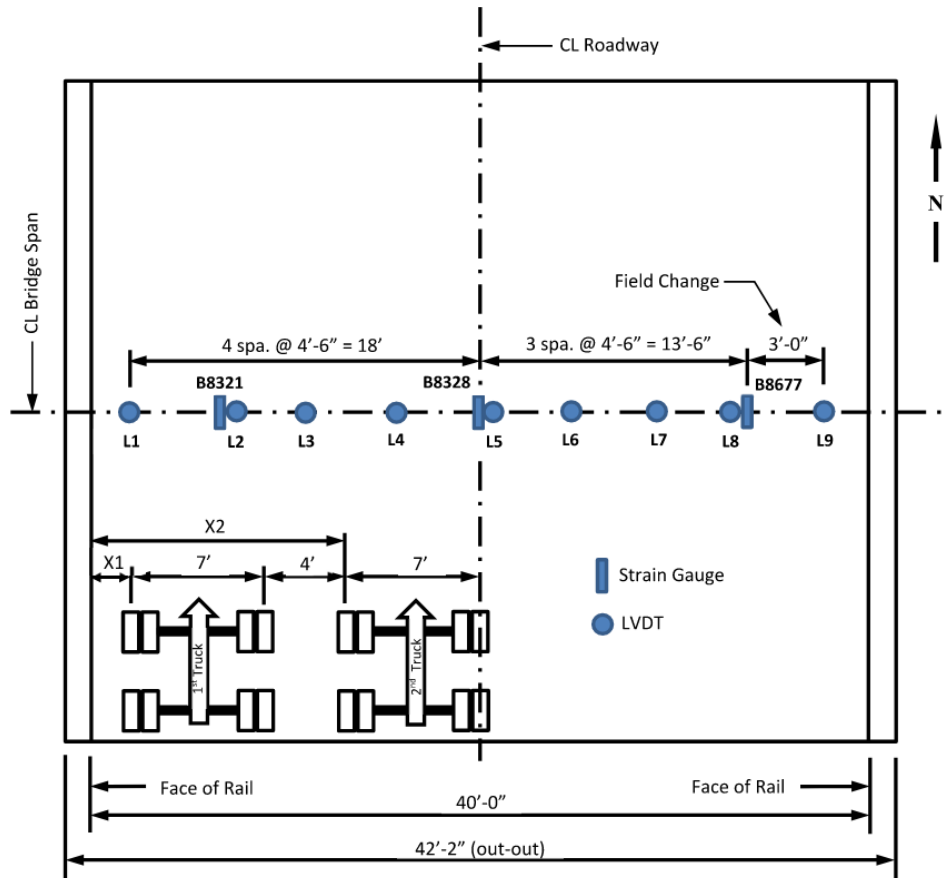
Illustration. Instrumentation plan of 0740013 bridge.
